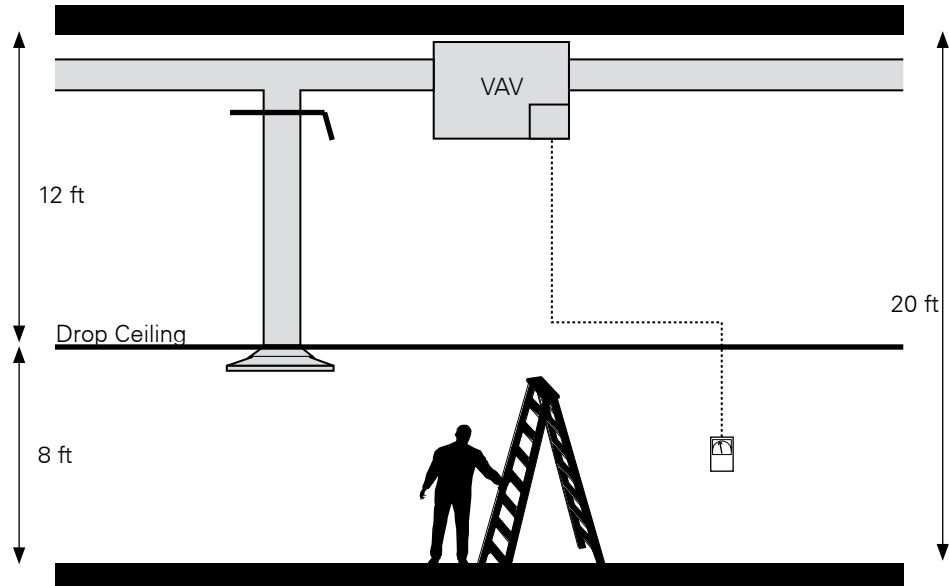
F Equipment Mounted High Above a Ceiling Can Be Impossible to Access
